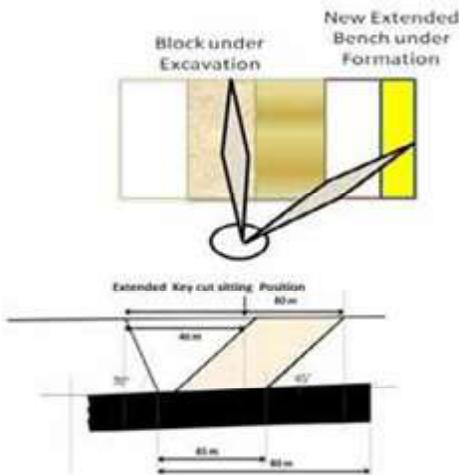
Plan and Section showing Dragline Working at Extended Key Cut position
